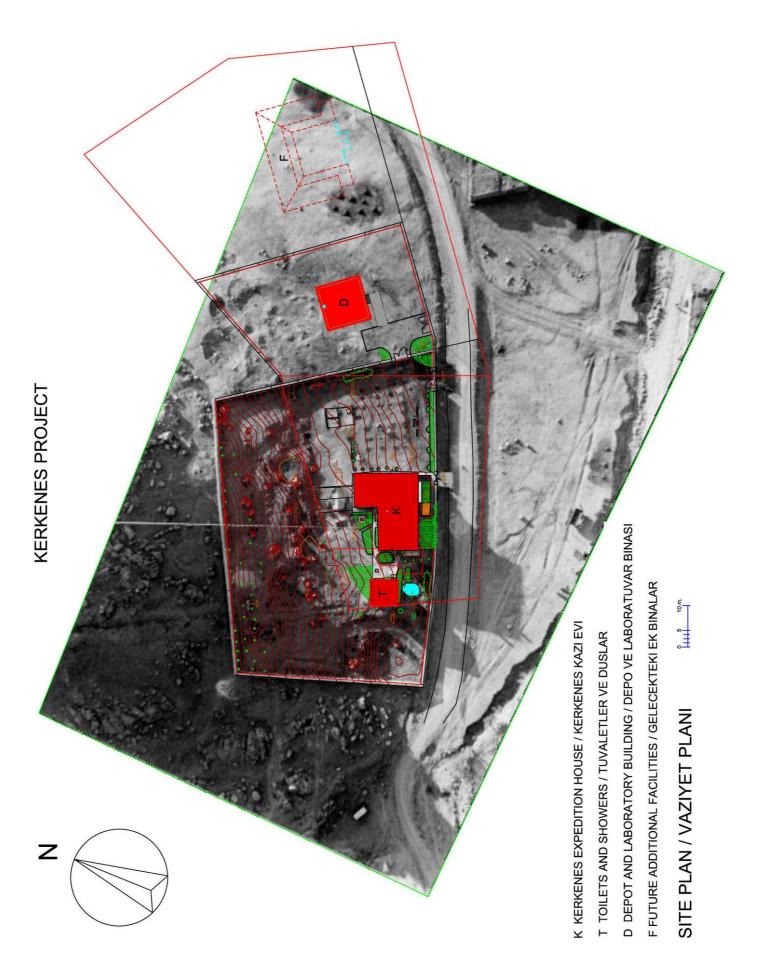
Site Plan showing the Kerkenes House superimposed on a balloon photograph.
